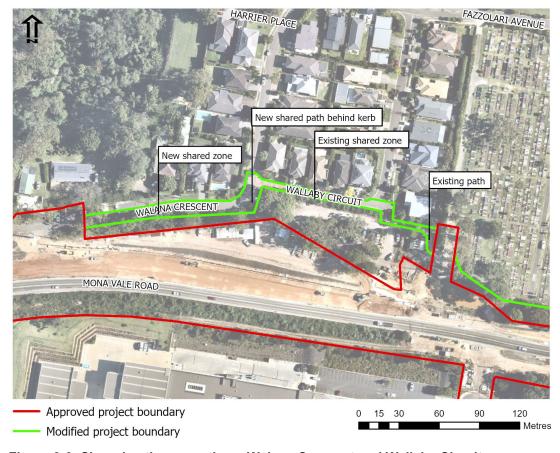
Shared path connection - Walana Crescent and Wallaby Circuit
